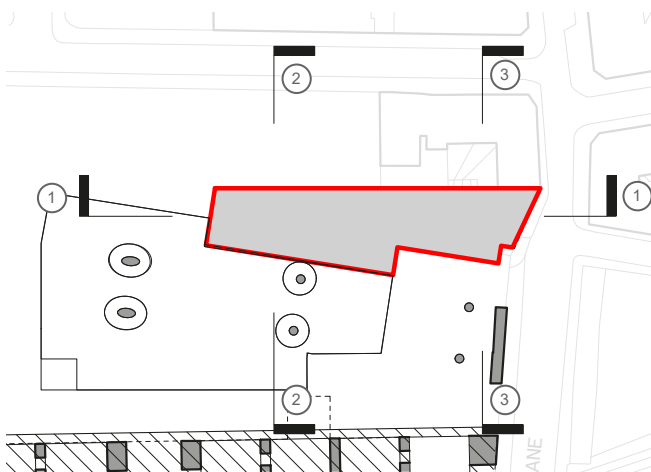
Ground Floor - Minimum and Maximum Parameters
